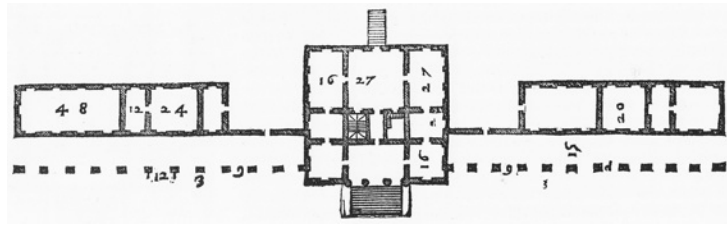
The proportion in the floor plan of Villa Emo at Fanzola, Palladio (Wittkower 1949).
